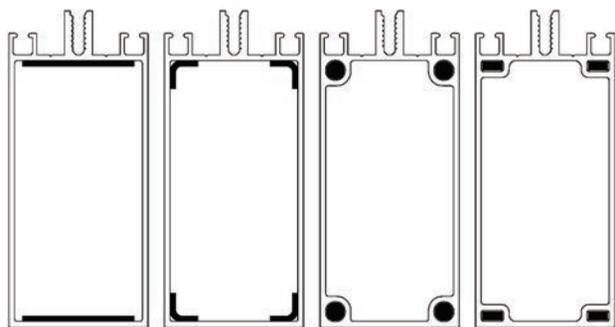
Some ideas for composite cross sections with bonded steel reinforcements
